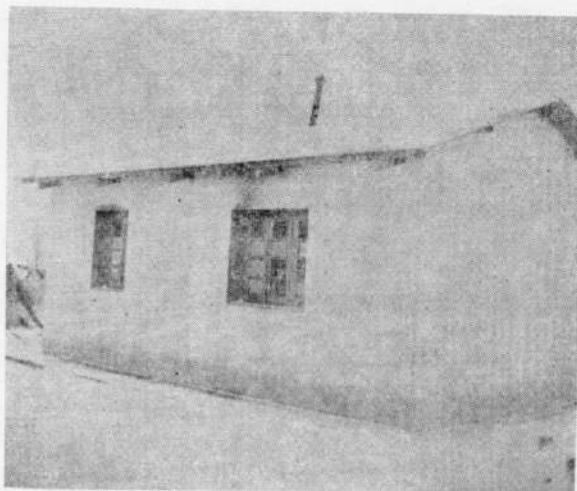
Revenue building built in stone masonry in cement mortar suffered no damage except for minor development of cracks at Chango village.
